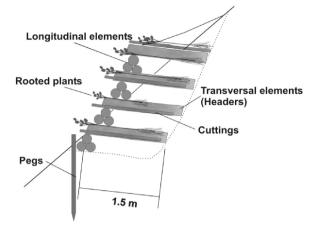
Sketch of vegetated bamboo crib wall construction. The vegetated bamboo crib walls were used as revetment walls to stabilise the base of the mountainside slope above the road. For the longitudinal elements three bamboos were fixed together. The transverse element consisted of only one single bamboo.
